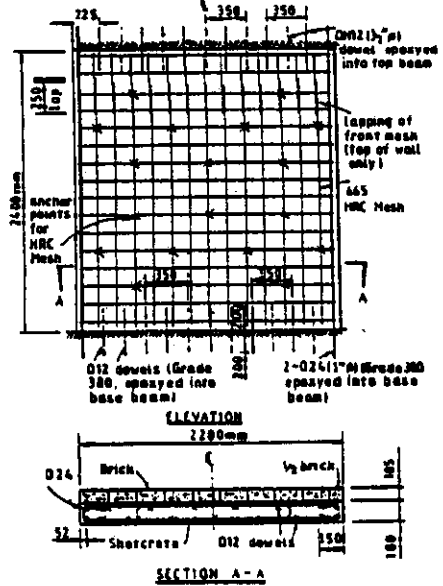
STRENGTHENING BY SPRAYED CONCRETE
